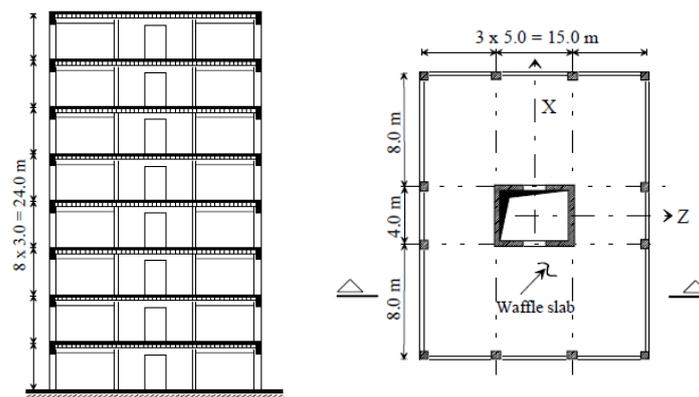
Target structure in elevation (*left*) and in plan (*right*)
